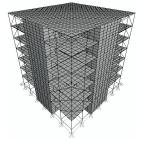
Building with soft storey with C- shape shear walls - Model 5
